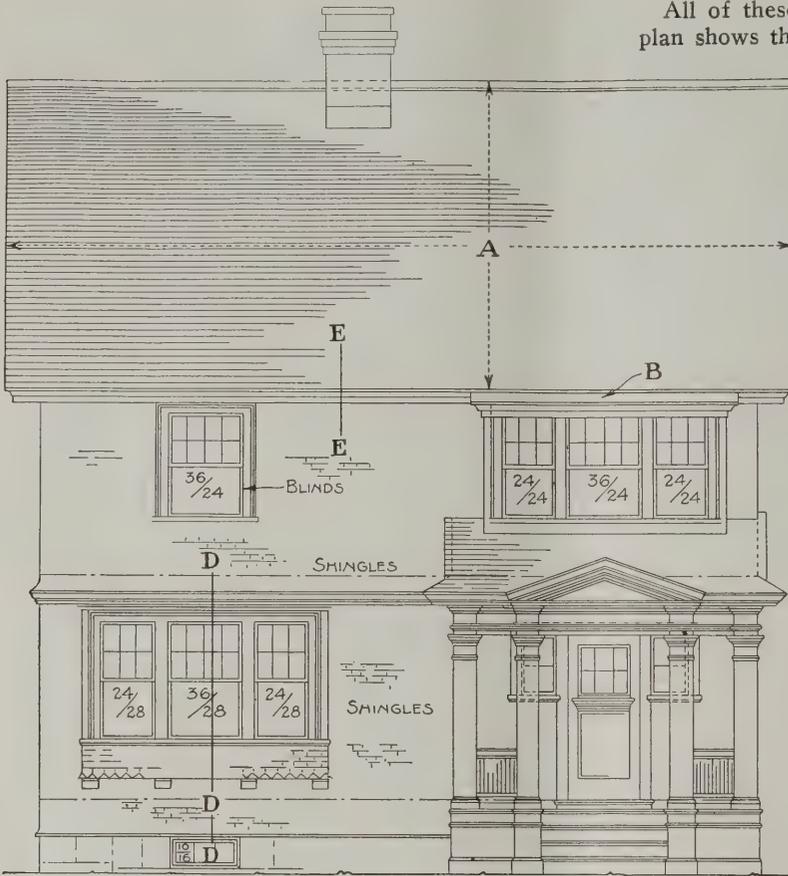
Front Elevation—Scale $\frac{1}{8}$ -In. to the Foot
